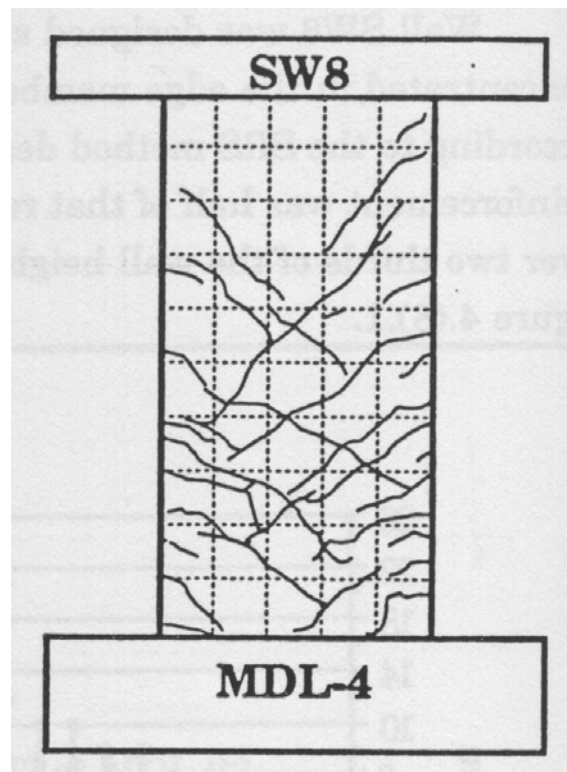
Condition of wall SW8 at 0.33% drift [Pilakoutas (1991)]
